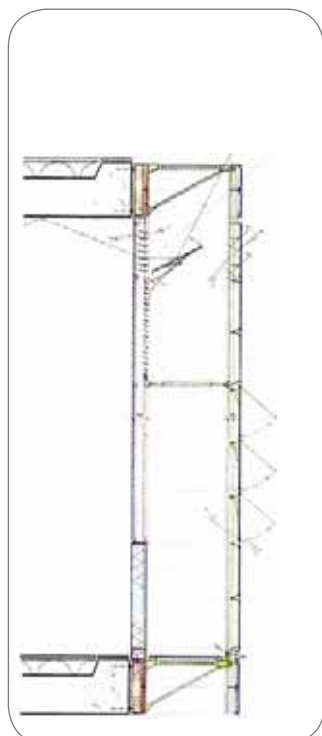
sectional studies_potzdamer platz building_renzo piano
